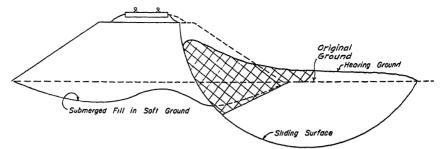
Pressure Grouting. Diagrammatic Sketch Showing Foundation Failure.
